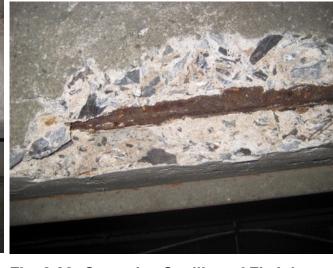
Corrosive Spalling of Fl. Joist
